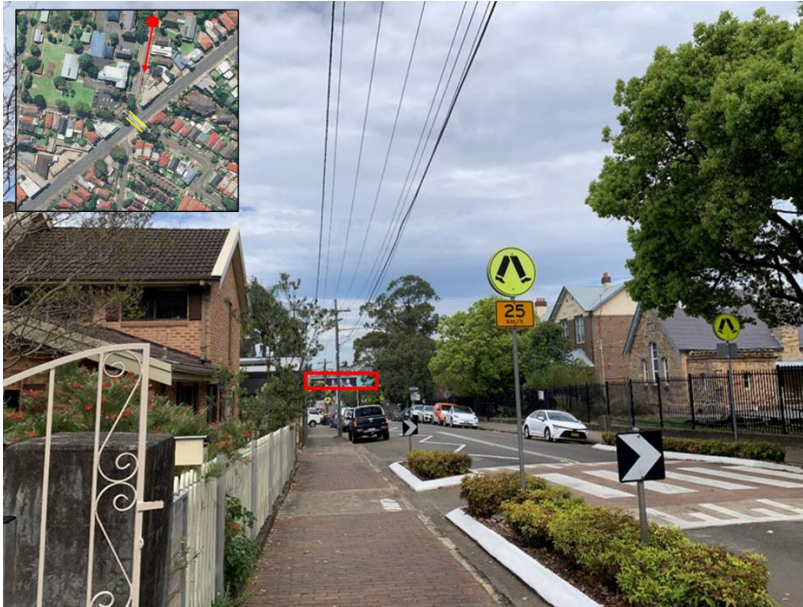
Looking south on footpath on Church Street looking towards the existing sign. Photo taken from the foot path on Church Street Victorian stone church, buildings and churchyard - St Paul's Anglican Church (item I97), 17–33 Church Street (Source: Keylan)
